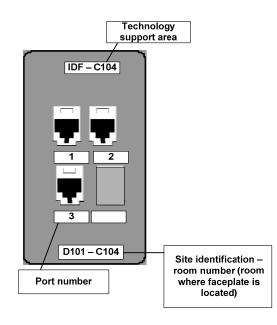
A – Typical Data Receptacle Labeling Scheme For Classrooms with Wall Mount Equipment Racks
